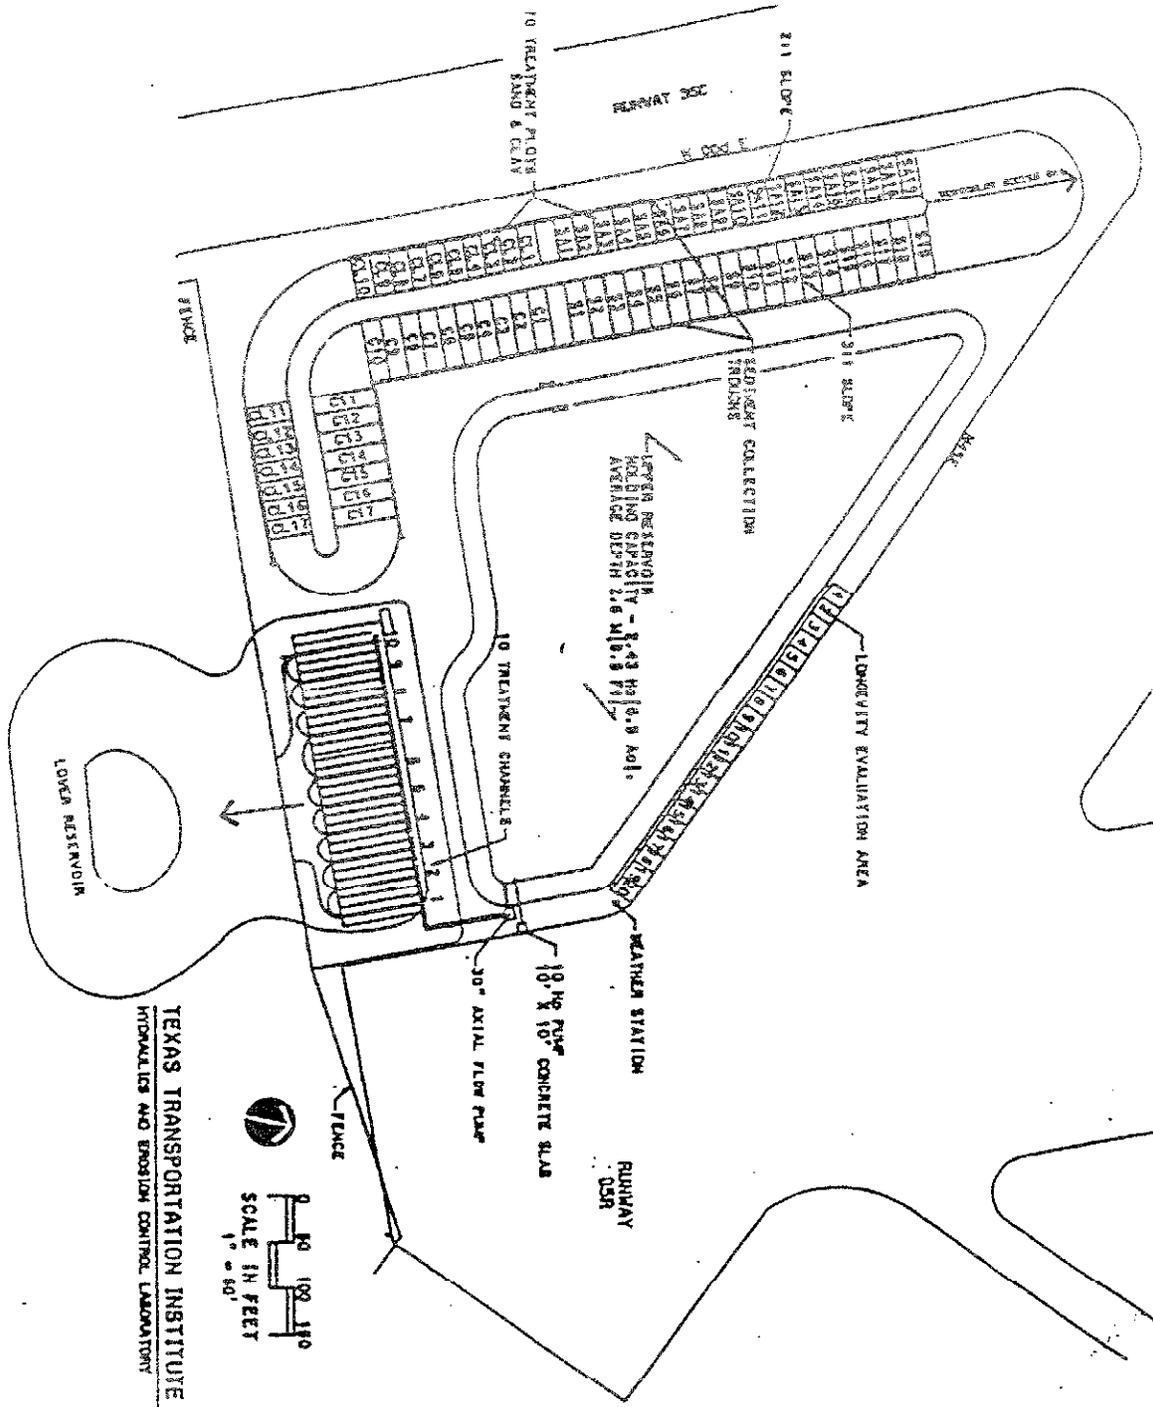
Plan of the Hydraulic and Erosion Control Laboratory
